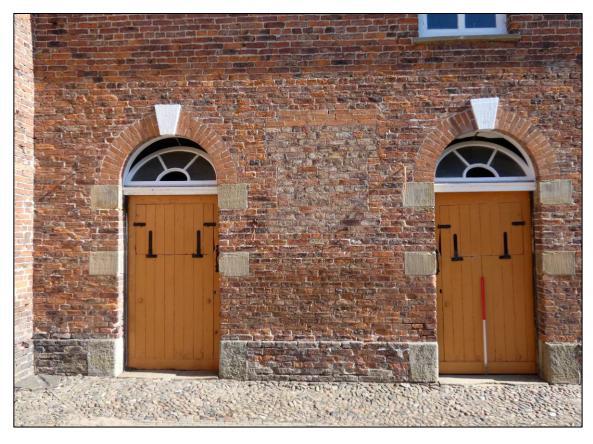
East courtyard elevation, north end, looking NE (photo 1/658).
